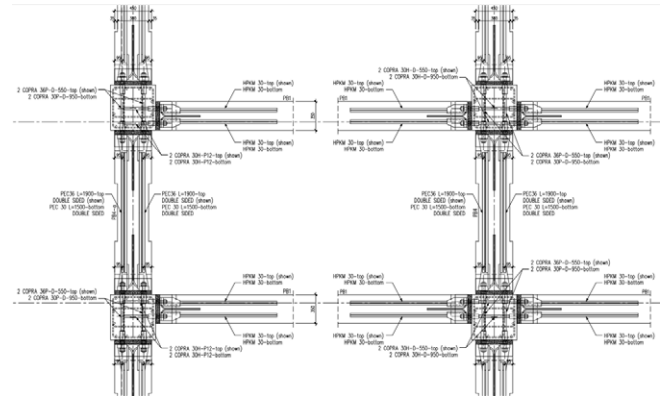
CLOSE-UP PLAN VIEW OF TYPICAL CONNECTION JUNCTIONS AT COLUMN-BEAM INTERFACES (ONLY BOLTED CONNECTION ELEMENTS SHOWN FOR CLARITY)
